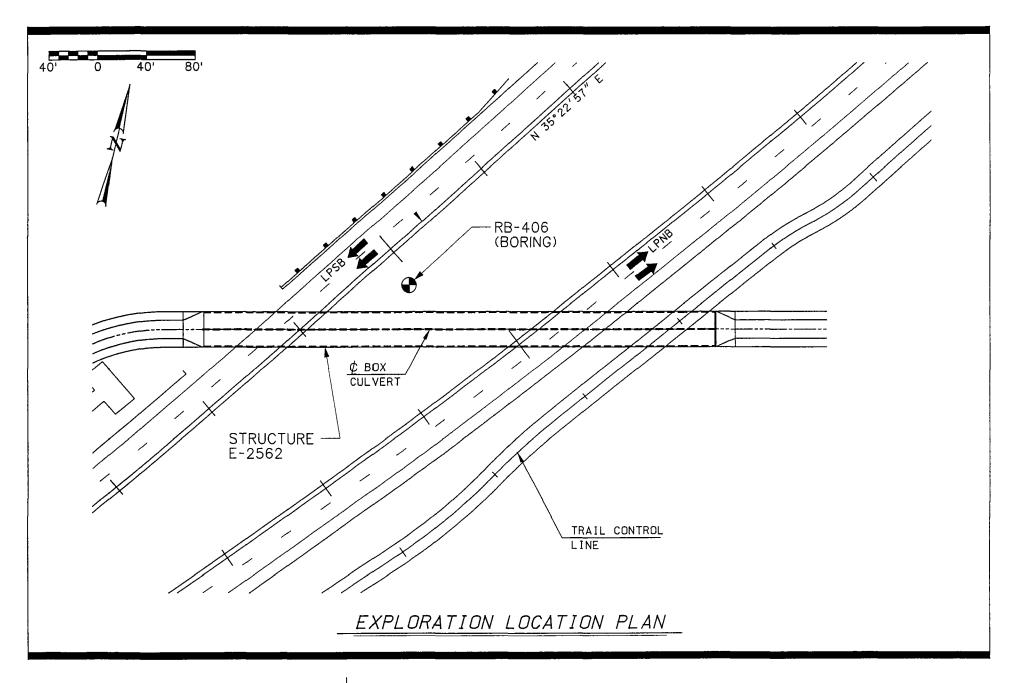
SITE PLAN & TEST HOLE LOCATIONS
